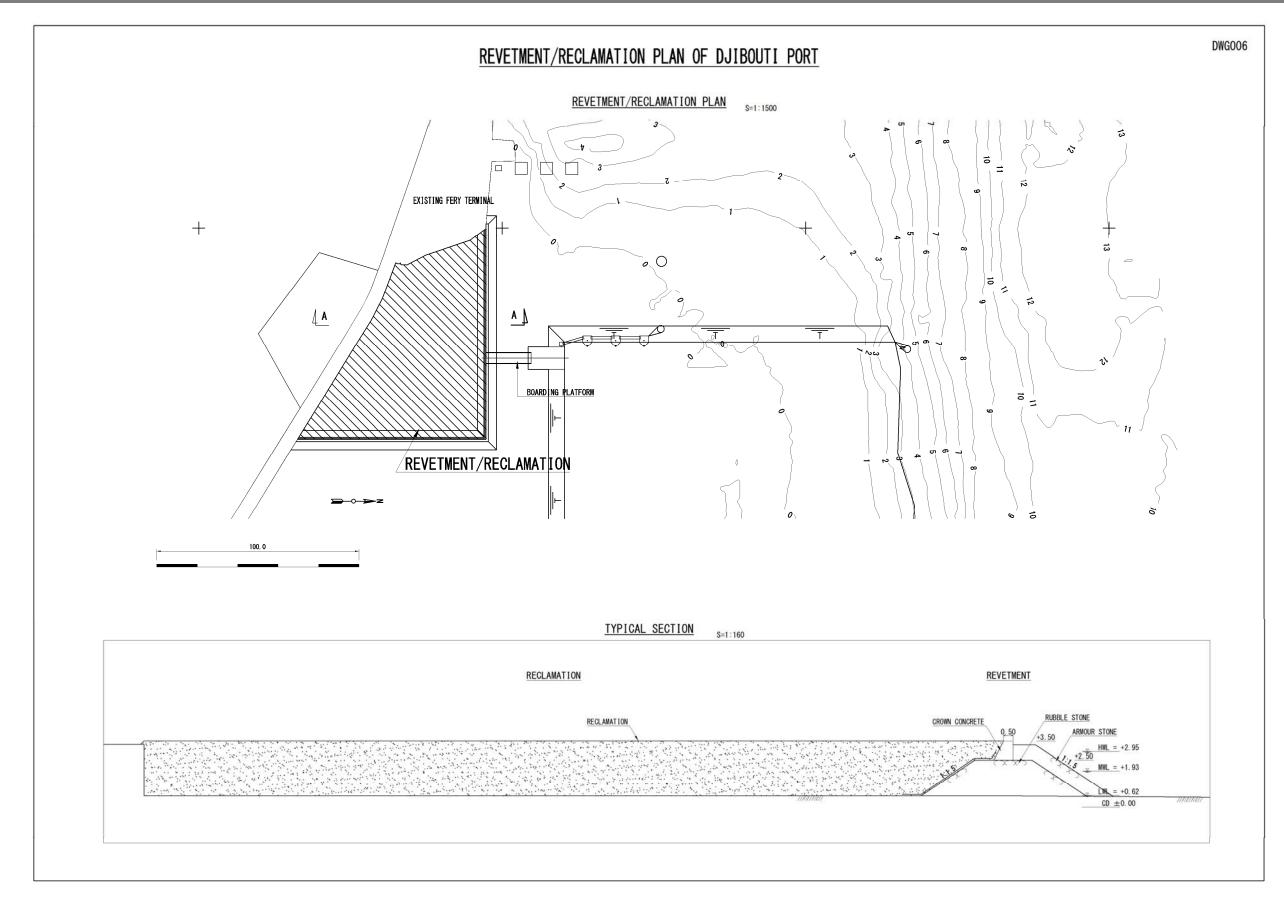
Revetment / Reclamation Plan of Djibouti Port
